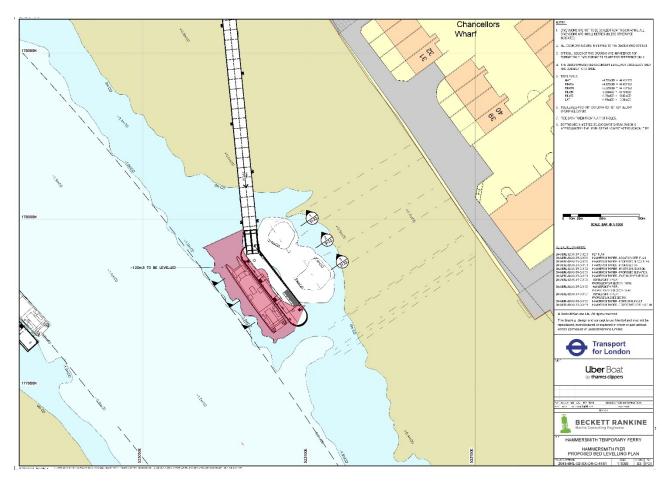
Location of sediment to be levelled via plough dredger at Hammersmith Temporary Pier Source: Beckett Rankine, Drawing 2048-BRL-02-XX-DR-C-4181 HAMMERSMITH - BED LEVELLING PLAN
